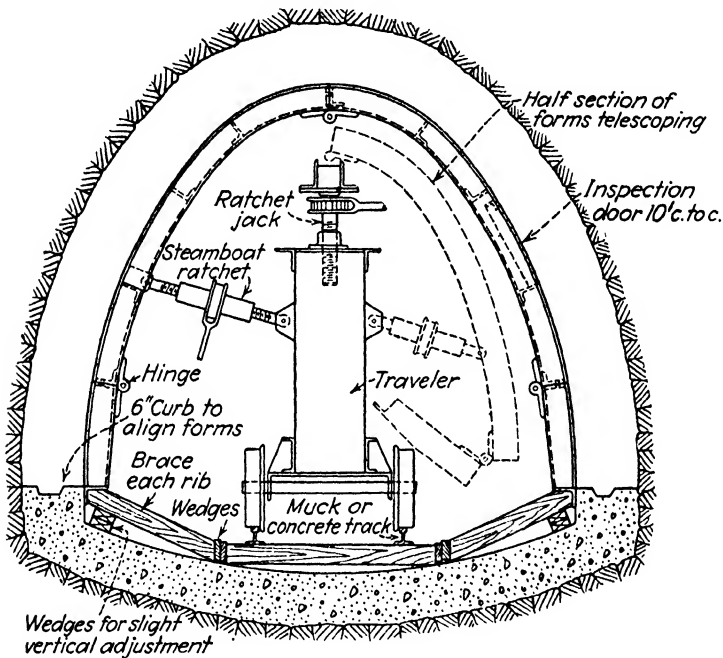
Telescoping steel forms. As soon as a unit has been moved and set, the traveler is disconnected and run to a siding to clear the track for muck or concrete trains.
